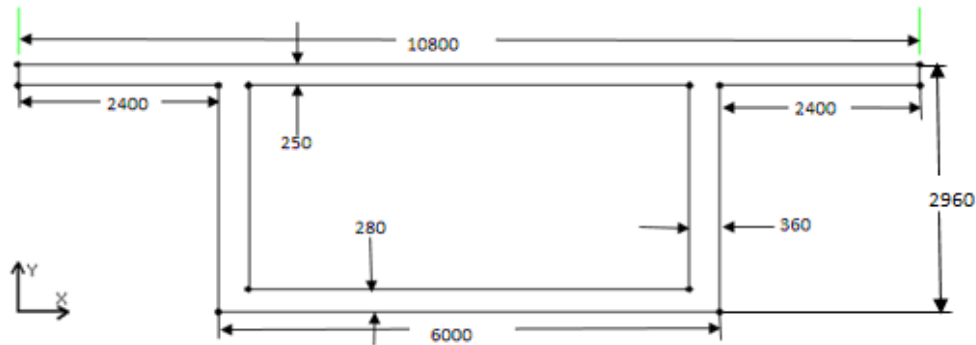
Cross-section of Han-Jiang bridge (dimensions are in mm)
